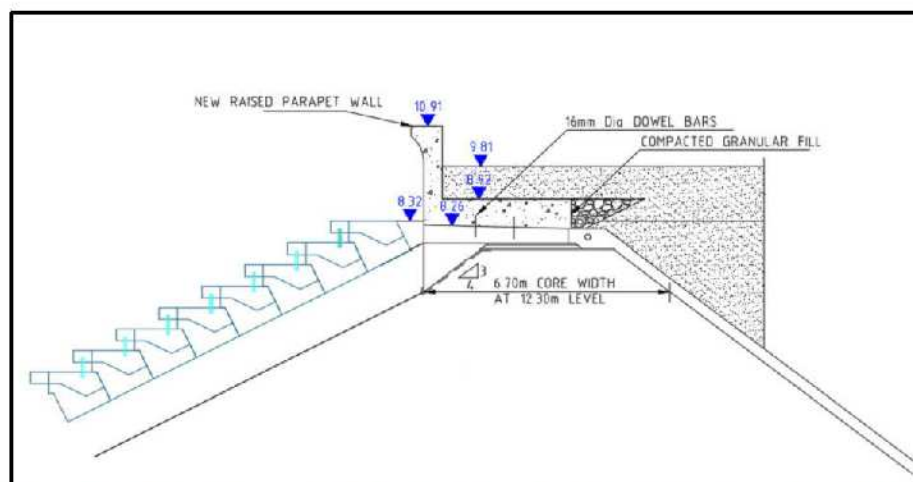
Raised Parapet Wall Typical Cross-Section (All levels are in mAOD)
